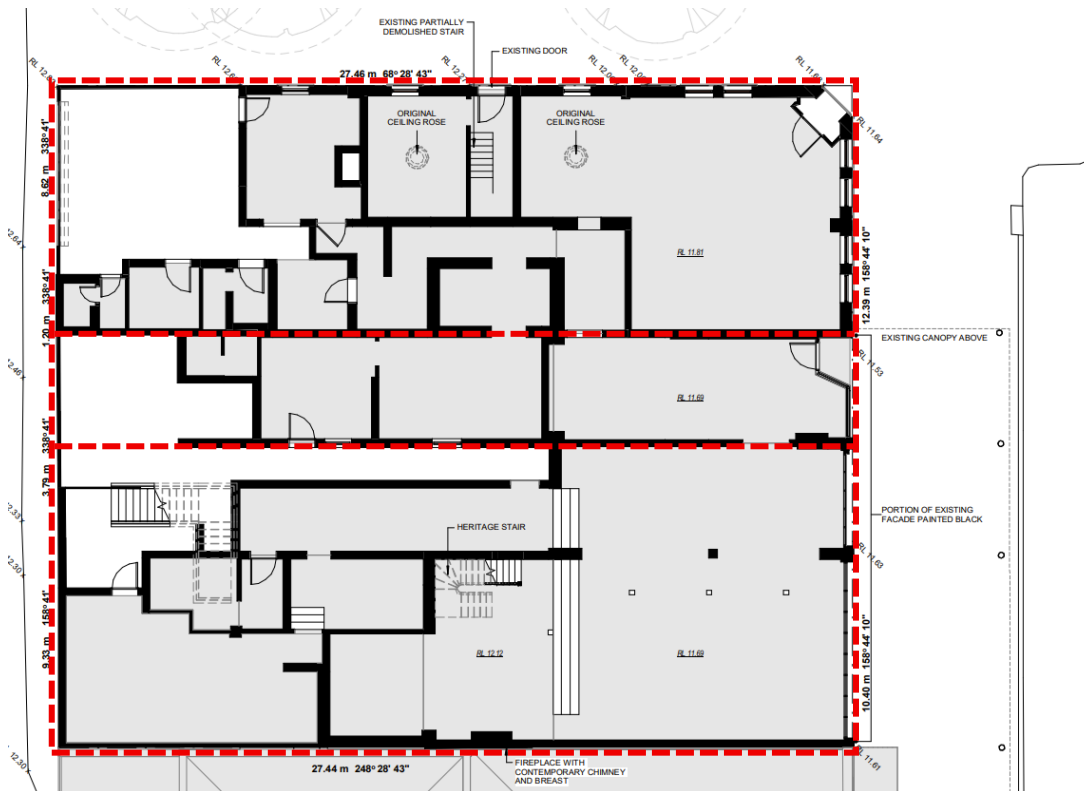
Existing ground floor plan showing the site being read as three terraces (north, centre, south). Source: Embrace Architects, 2026.
